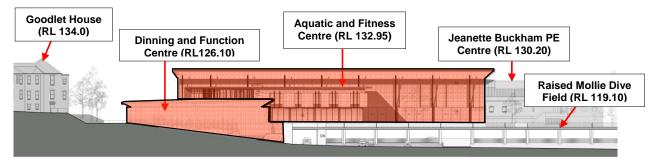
Western Elevation of Concept Proposal Building Envelopes (Shown in Orange)
